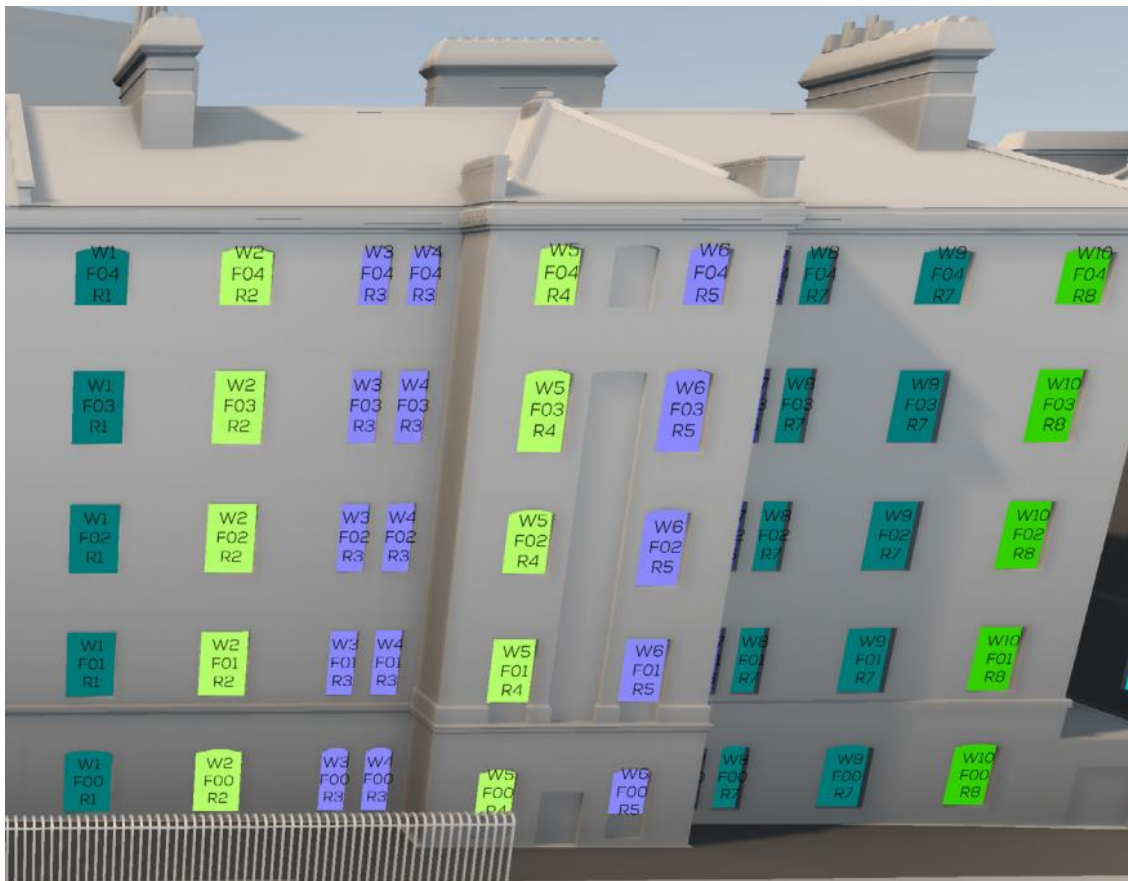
Block A windows facing south towards the Southwark Street arm of the proposed development.
